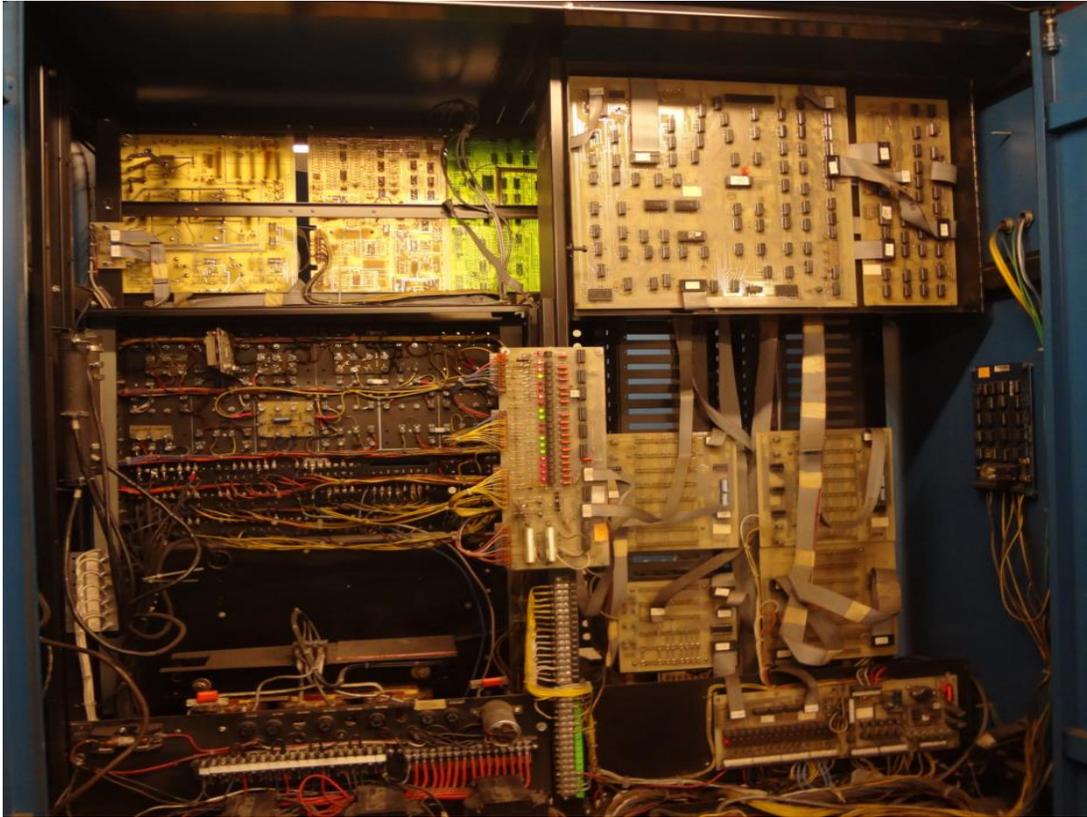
Hydro Place – Elevator Control System at the Penthouse.
